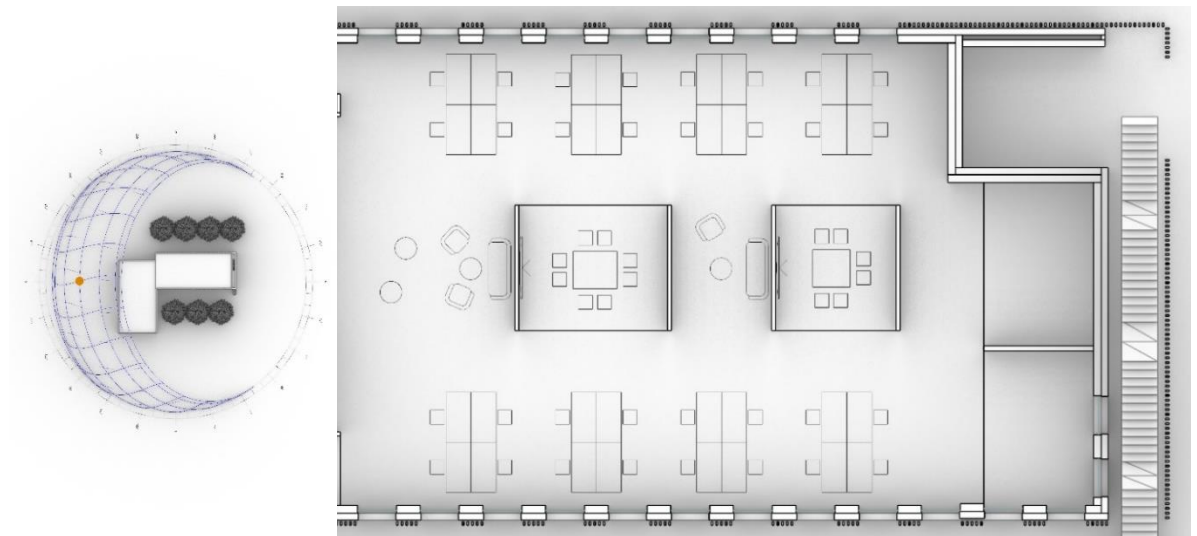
Top view with cardinal directions (right) and floor plan of the space (left)
